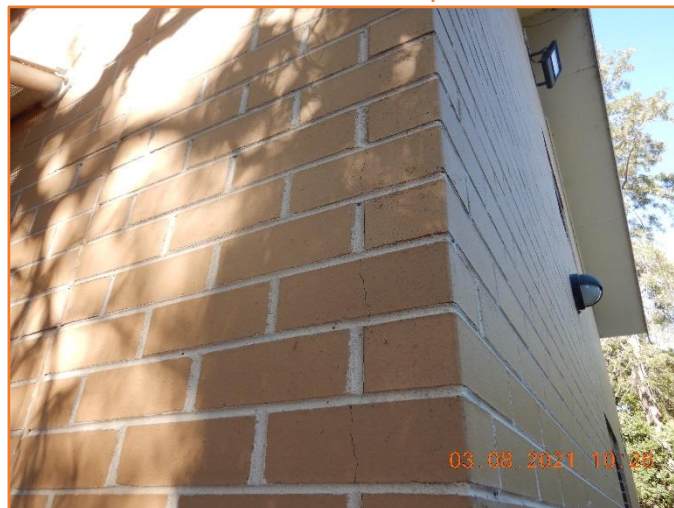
Reasonable - General condition of external masonry wall. Moderate hairline cracking observed.
